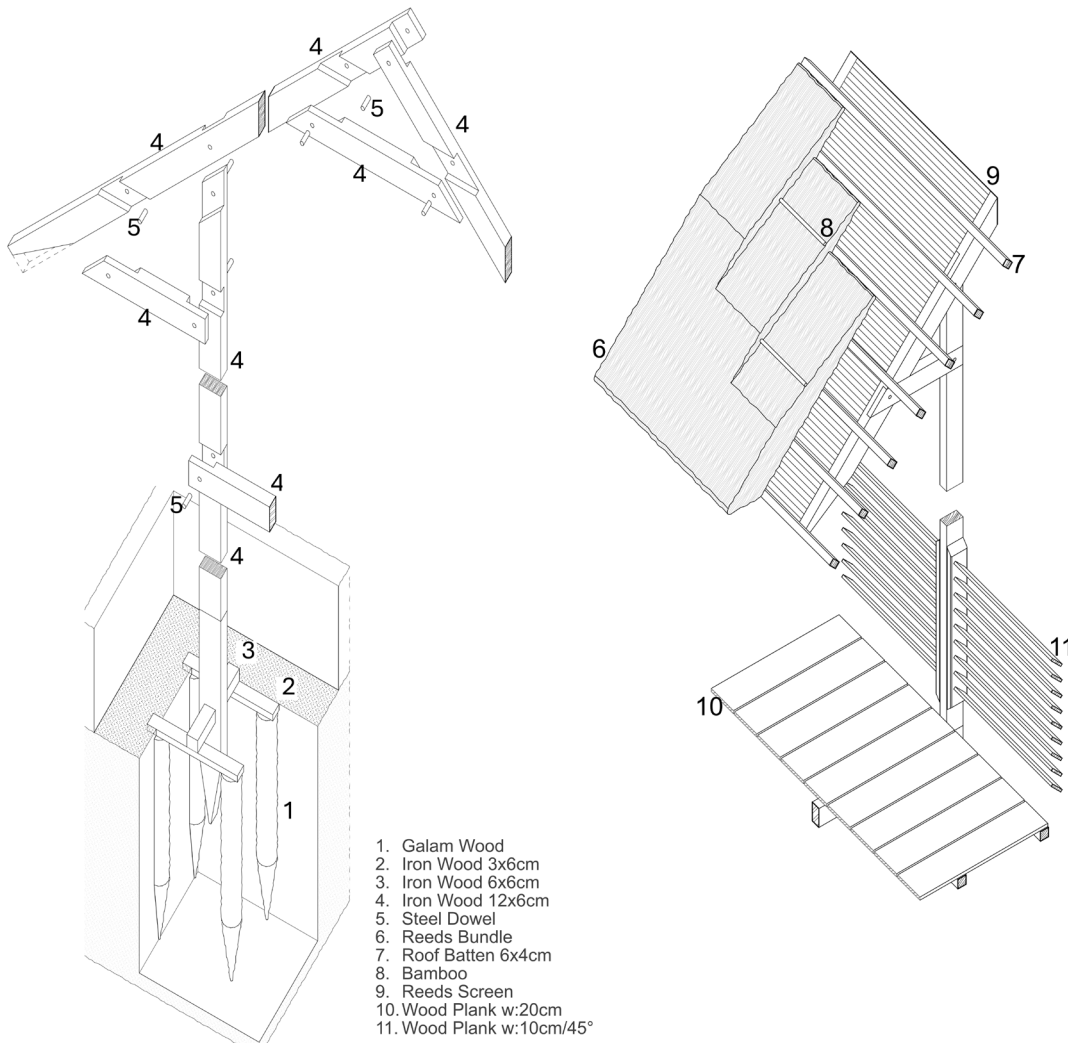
Detail of the structure (left); detail of the roof and floor (right) (Images by author)
